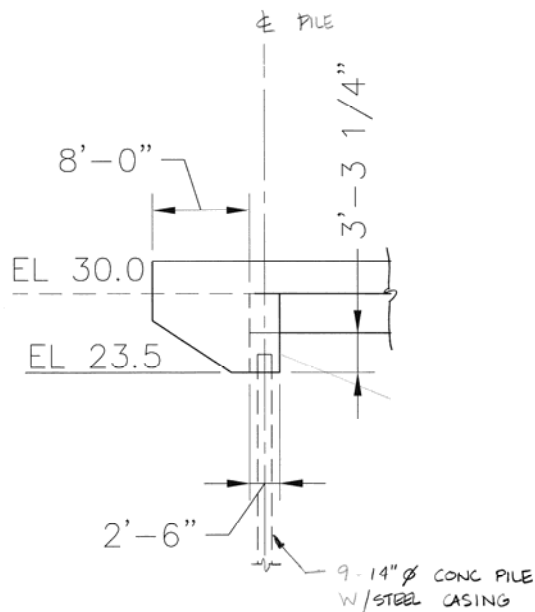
Elevation of Integral Abutment, Missouri Bridge
